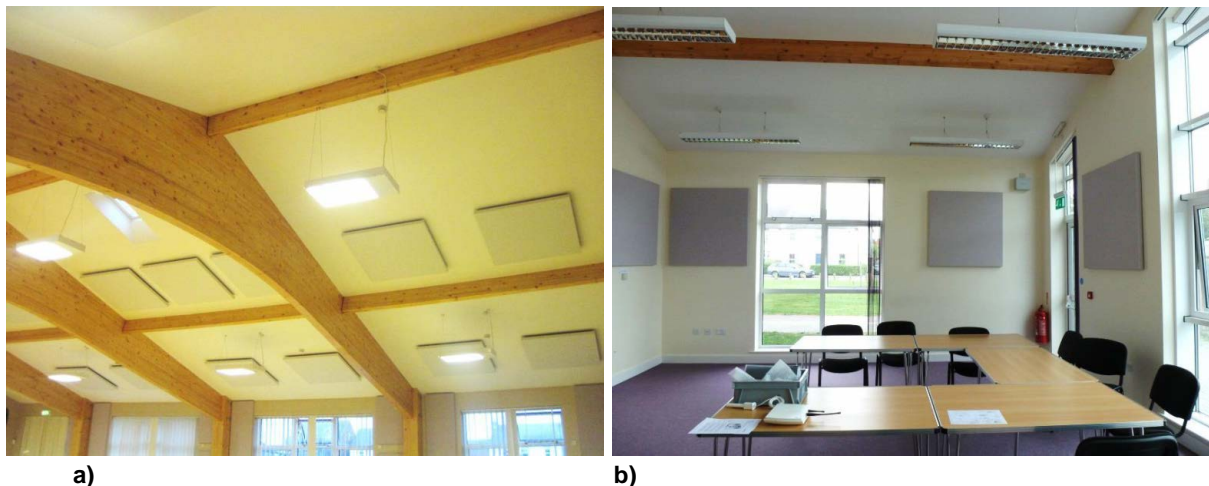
(a) Acoustic panels placed on the ceiling of the main hall. (b) Acoustic panels placed on the walls of the Meeting Room 1.
